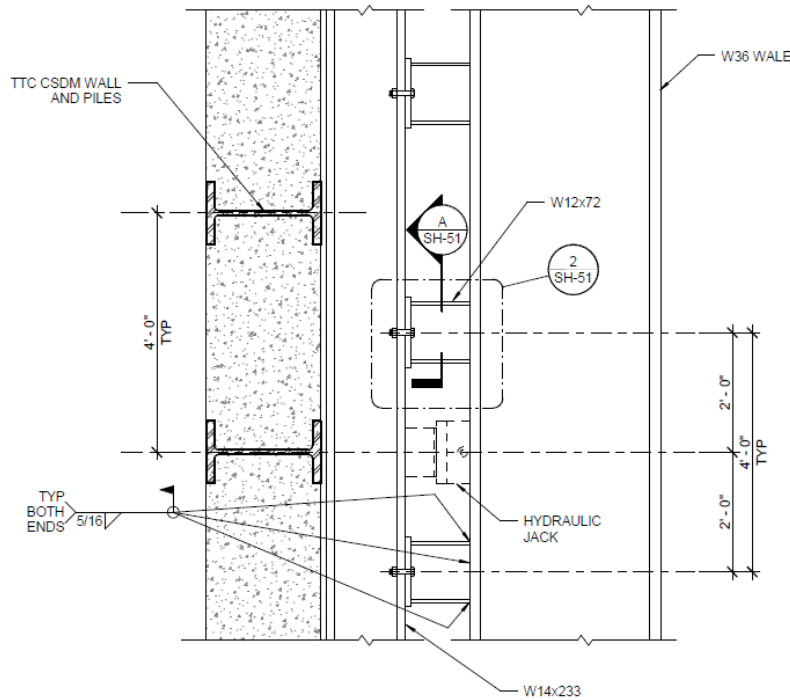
Plan view of spaced wale pair detail for bracing load adjustment at shared TTC shoring wall
